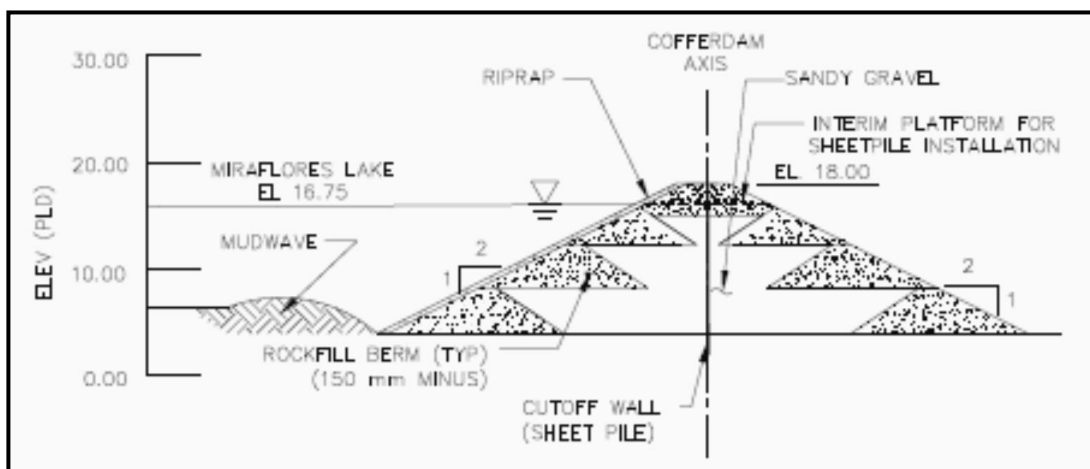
Typical Section of the Embankment cofferdam with sheet pile cutoff
